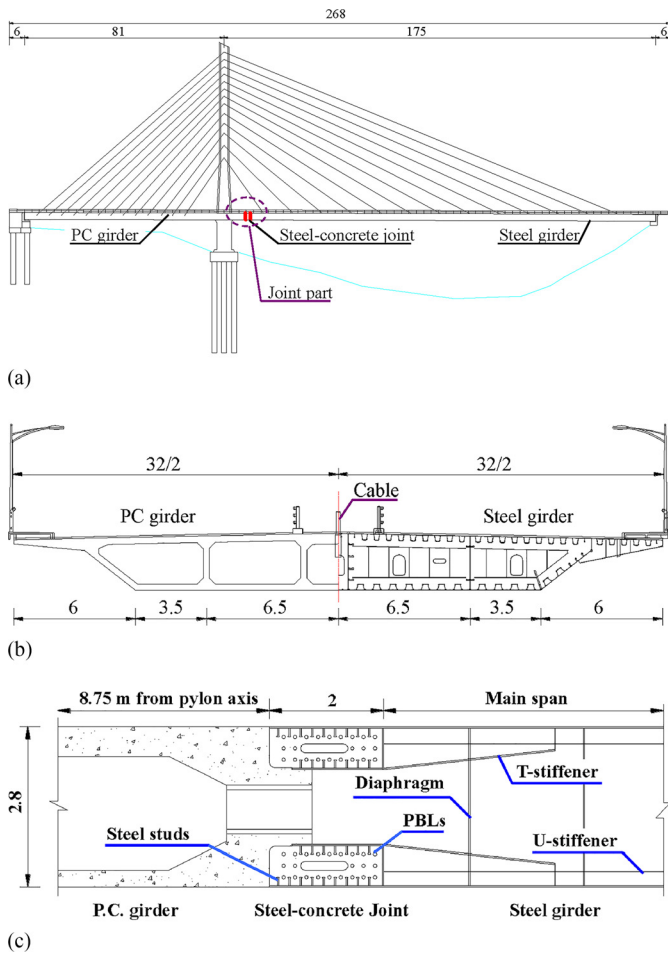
Nujiang Bridge: (a) elevation view; (b) cross section of main girder; and (c) steel–concrete joint arrangement. (unit: m).
